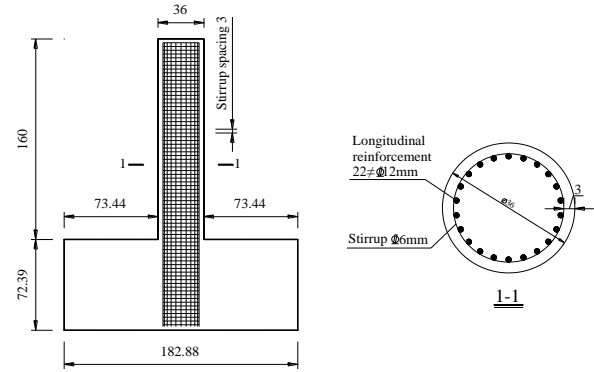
Geometry of the cantilevered reinforced concrete pier (unit: cm)
